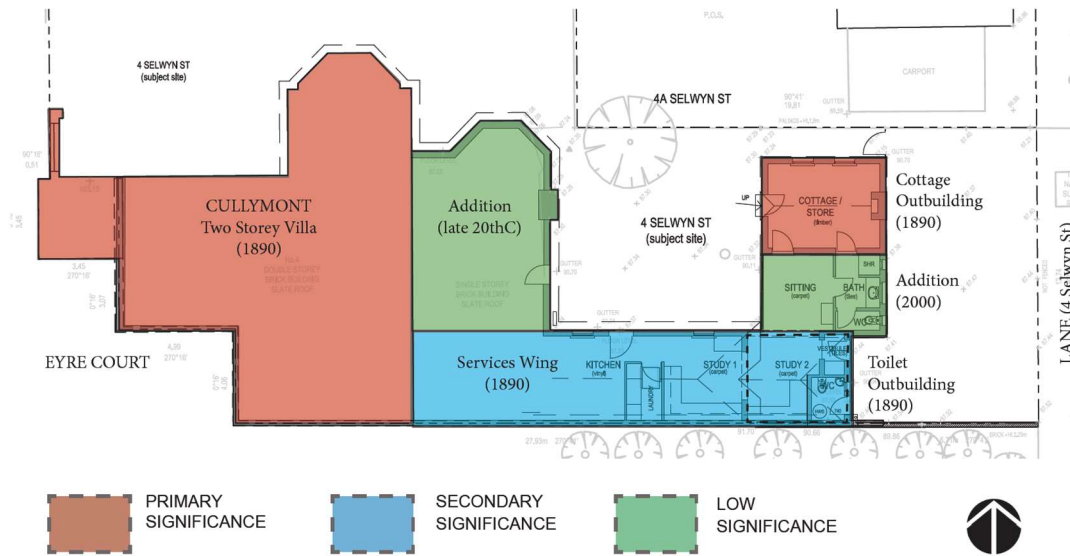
Existing Conditions floor plan, showing the levels of significance.
